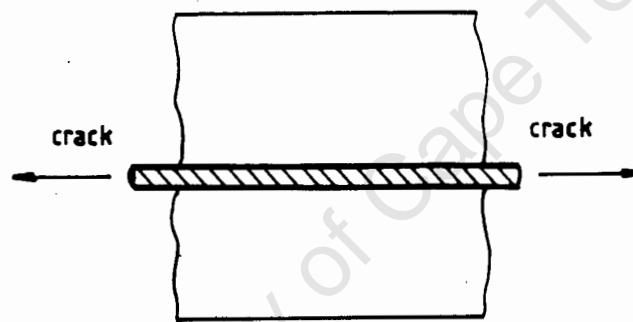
Tension-Cracking in Reinforced Concrete.
